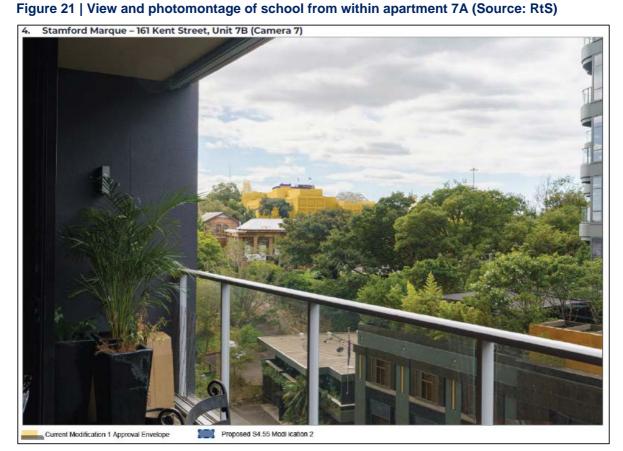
| View and photomontage of school from within apartment 7B (Source: RtS)
